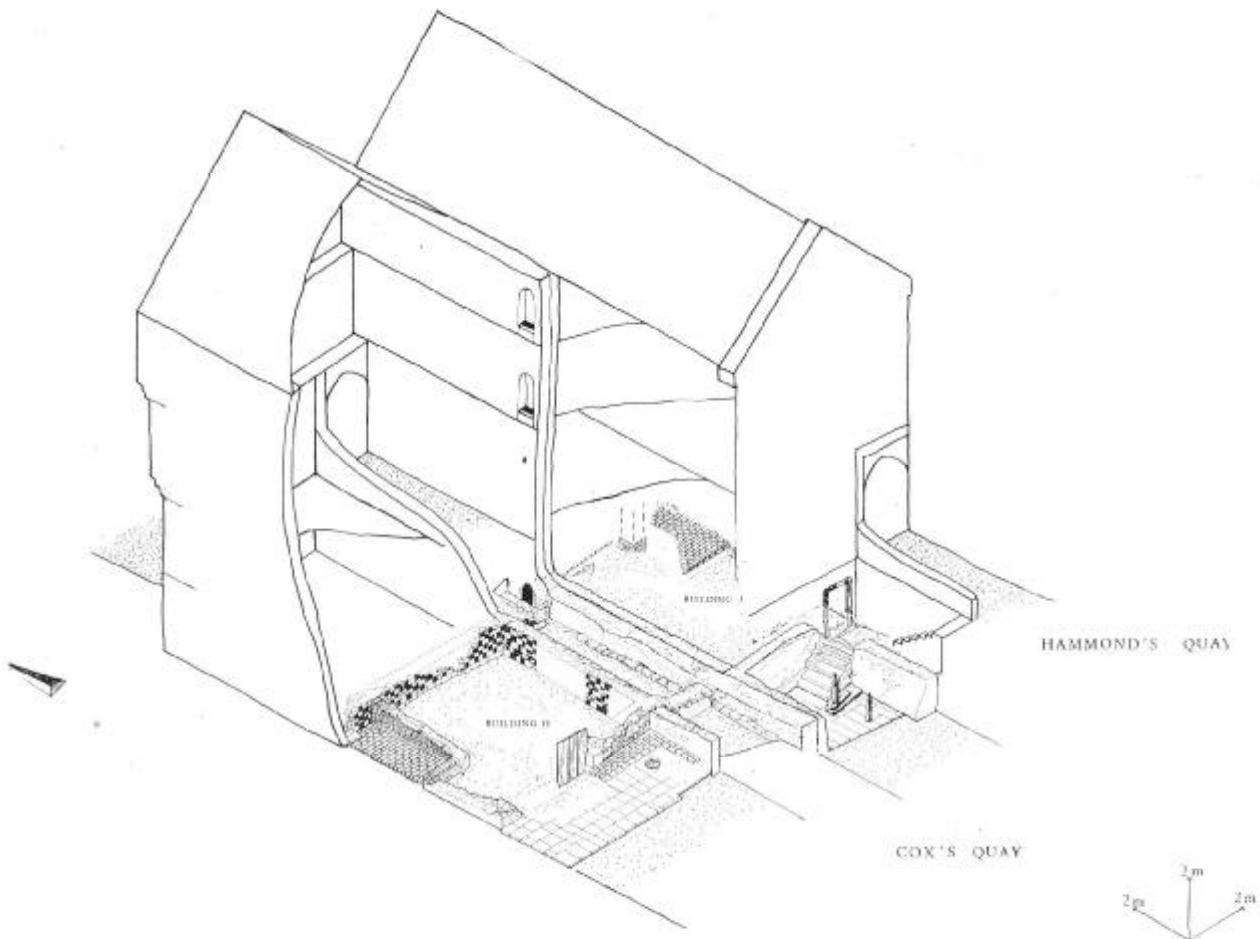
Buildings H and J: reconstruction with the proposed line of medieval Thames Street.
